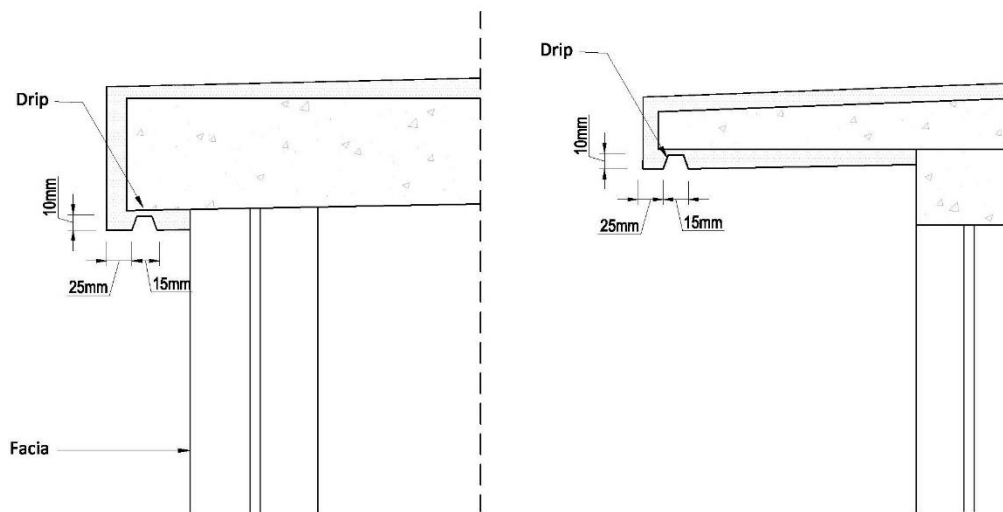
Typical drip edge detail on projected façade elements. Image on the left illustrates detail on recessed window and image on right illustrates detail on sunshades.
